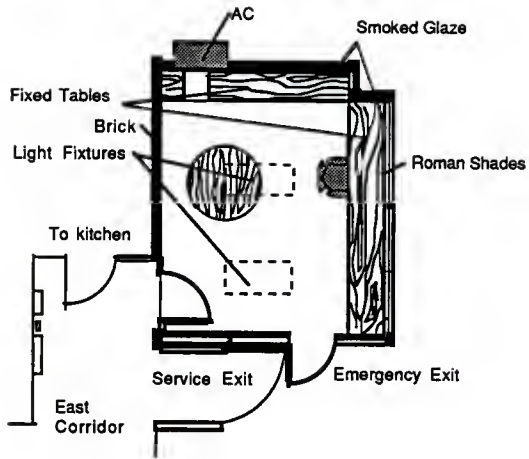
The Garden Room Plan. (Scale: 1/8" = 1' 0" North Δ).
